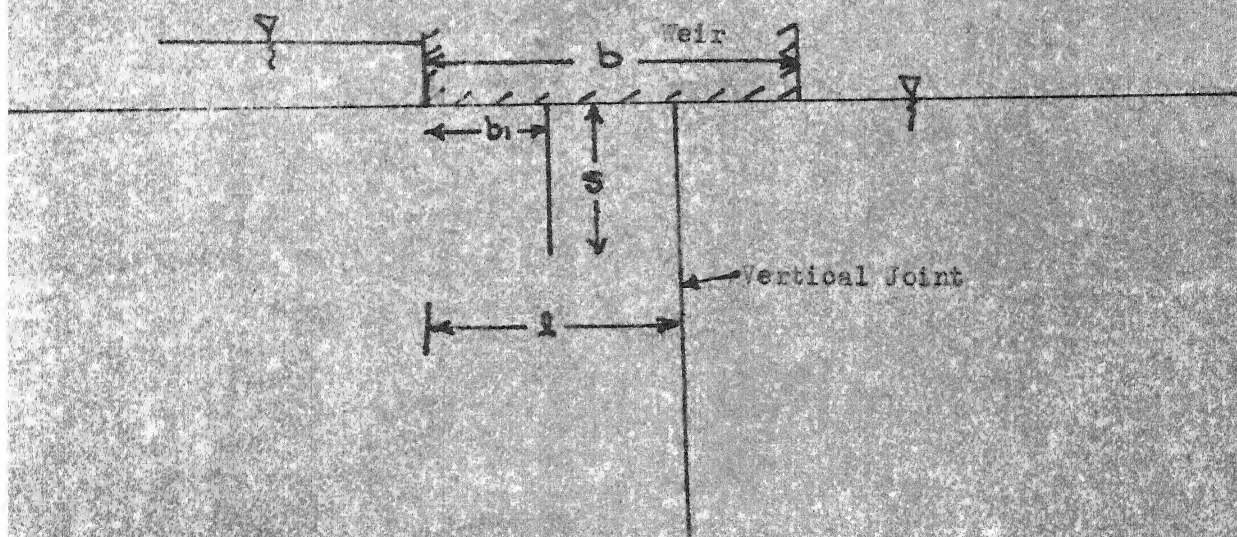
(b) Weir resting on rock foundation with a vertical joint.
